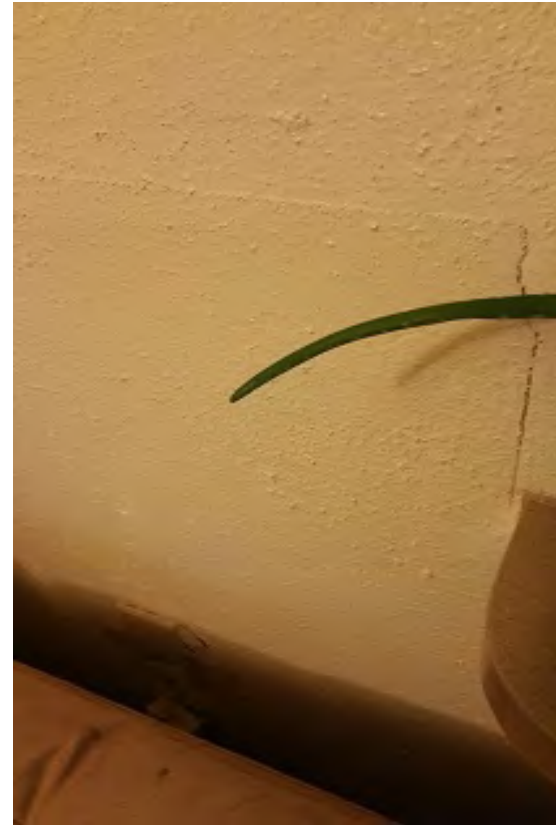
Unit 112: Crack near Kitchen Counter
